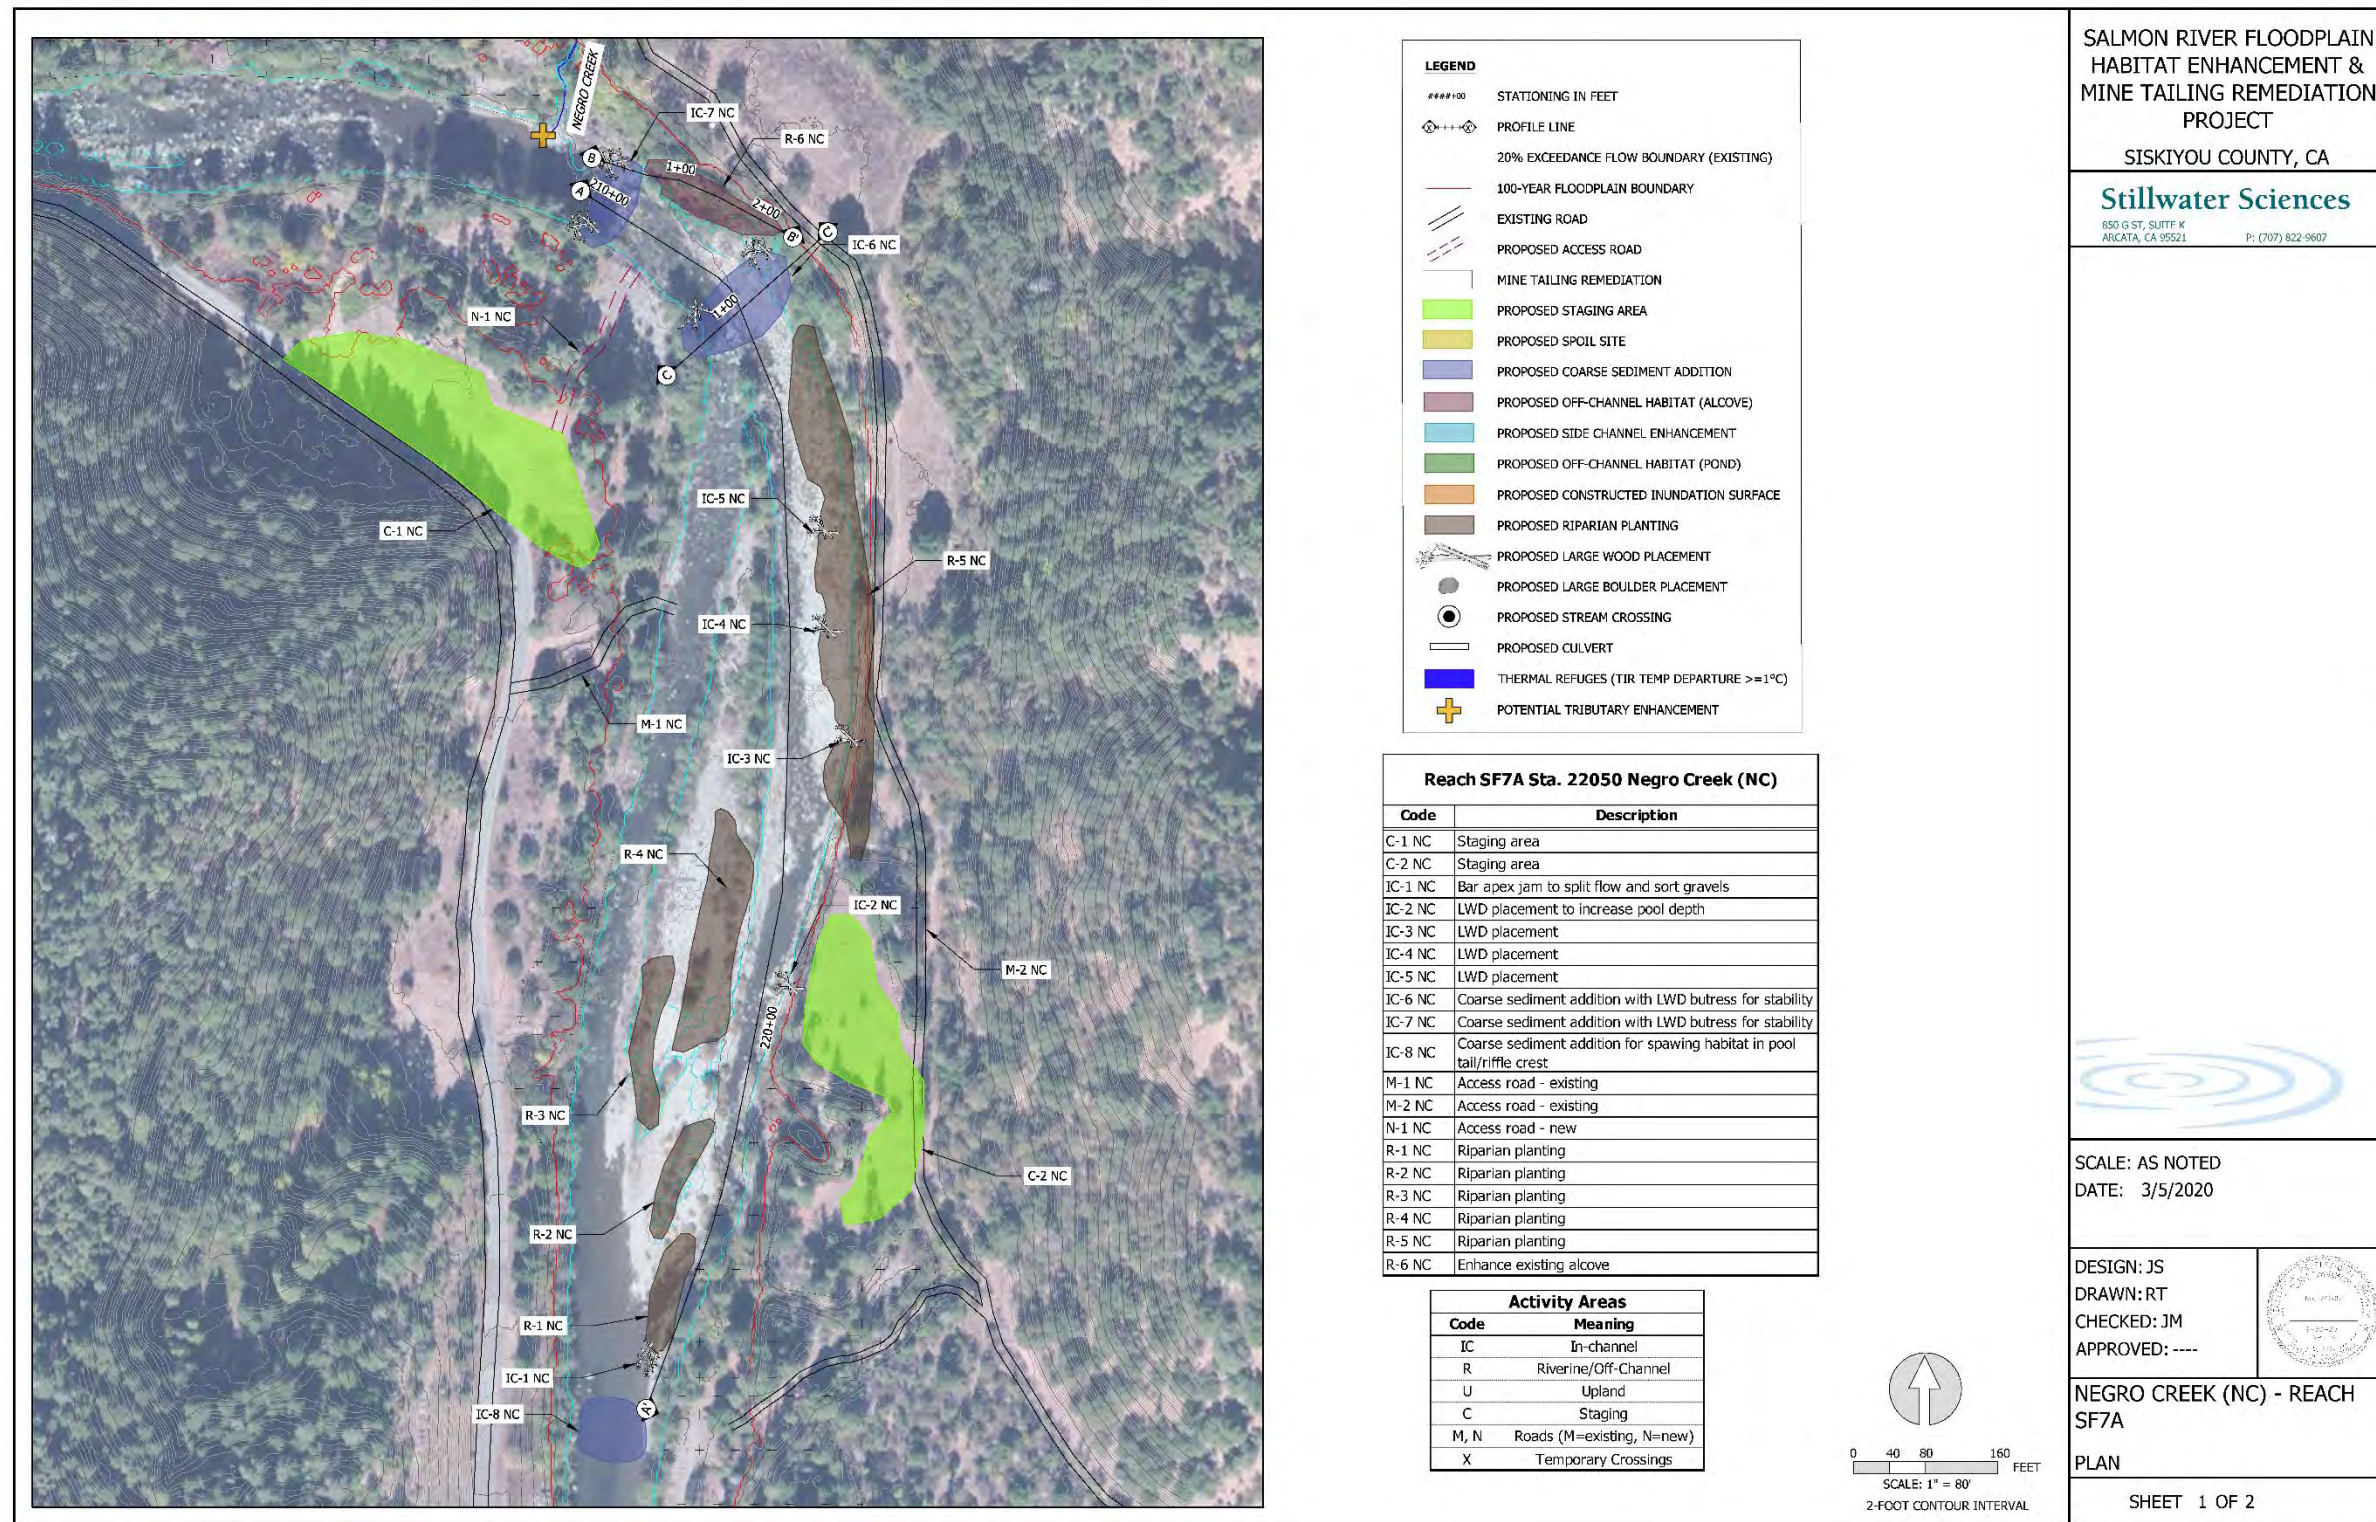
Design plan for South Fork Reach 7A at Negro Creek.
